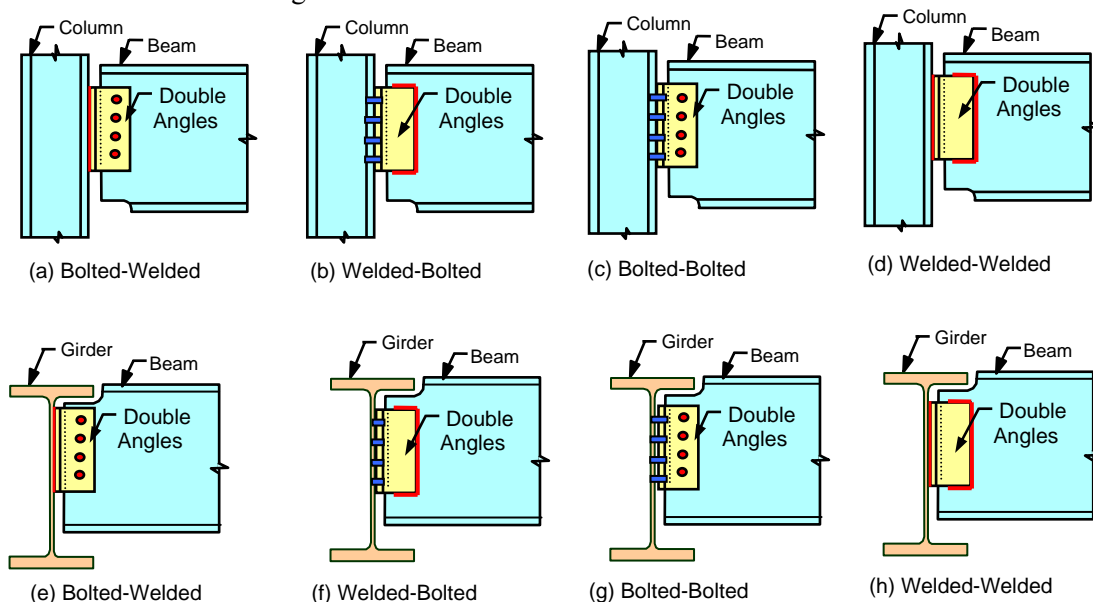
Four Types of Double-Angle Shear Connections for Beam-to-Column and Beam-to-Girder Cases
